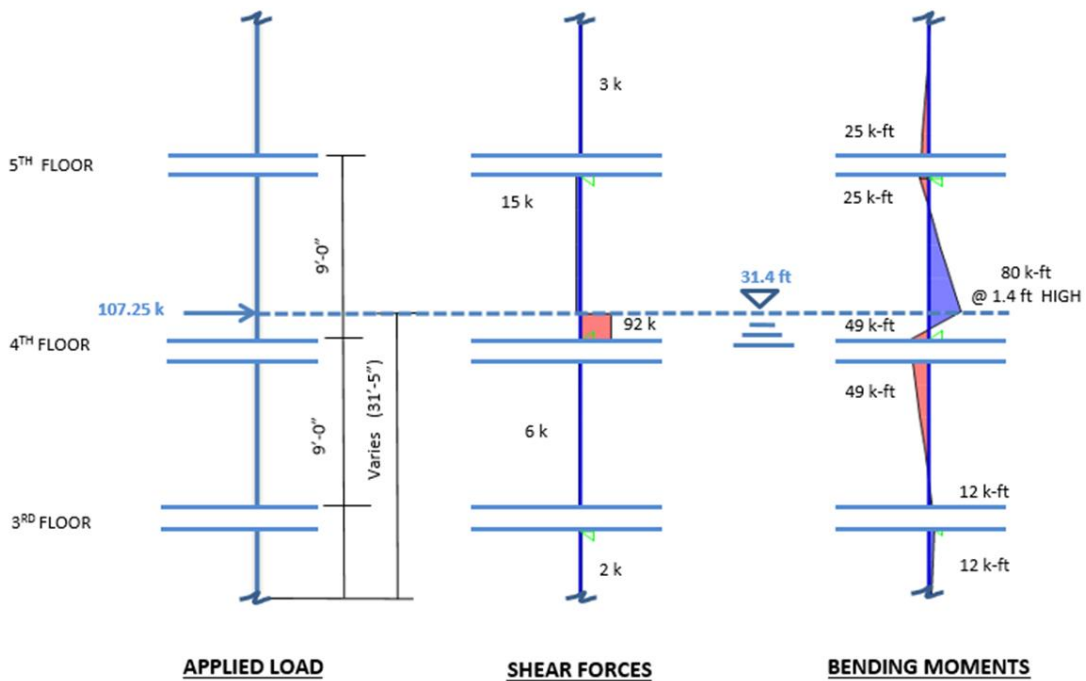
Impact load applied at 1.4 ft away instead of "d" as water level is lower than "d" away from the end of column on the 4th floor
